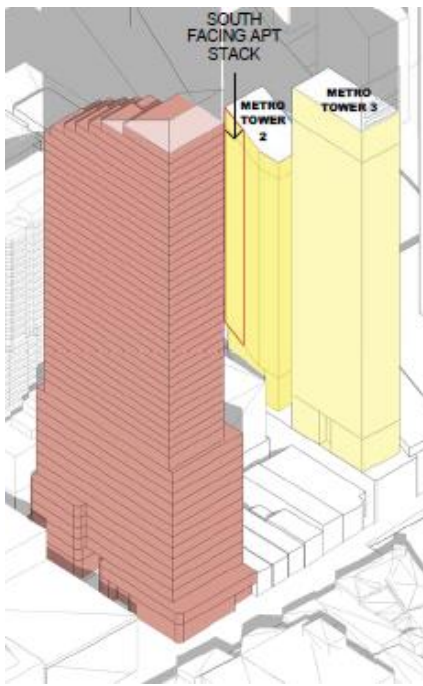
10.30am Solar access mid-winter to the Metro Towers Victoria Avenue west of the site (source: Mirvac Design)
